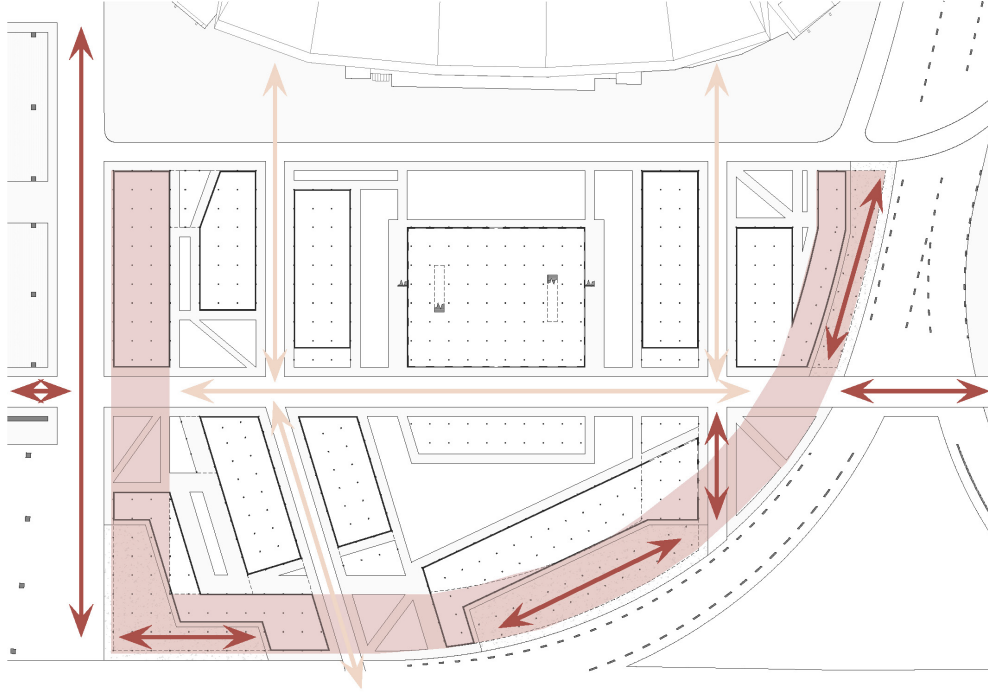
, Urban Center - Enlarged Plan – Alcove/Circulation (Source: Drawn by Author)
